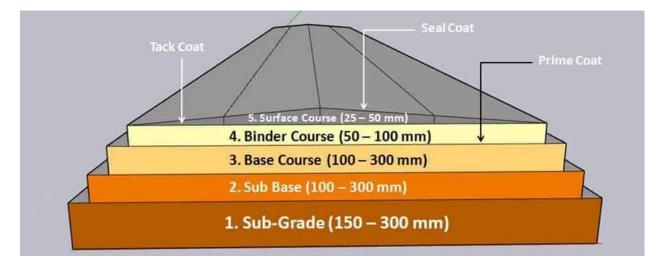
Typical section of a flexible pavement (civilengineering.com)
